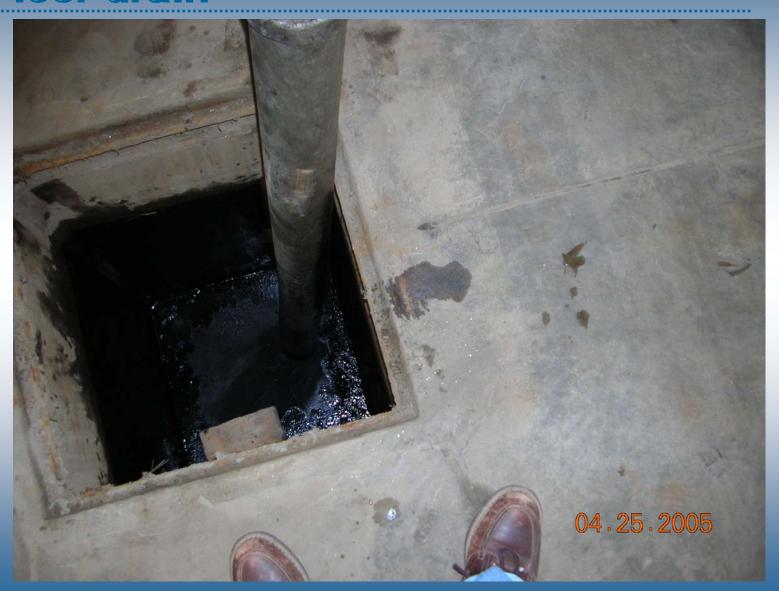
of SPCC Plan: INTERIOR DRAINAGE FEATURES
